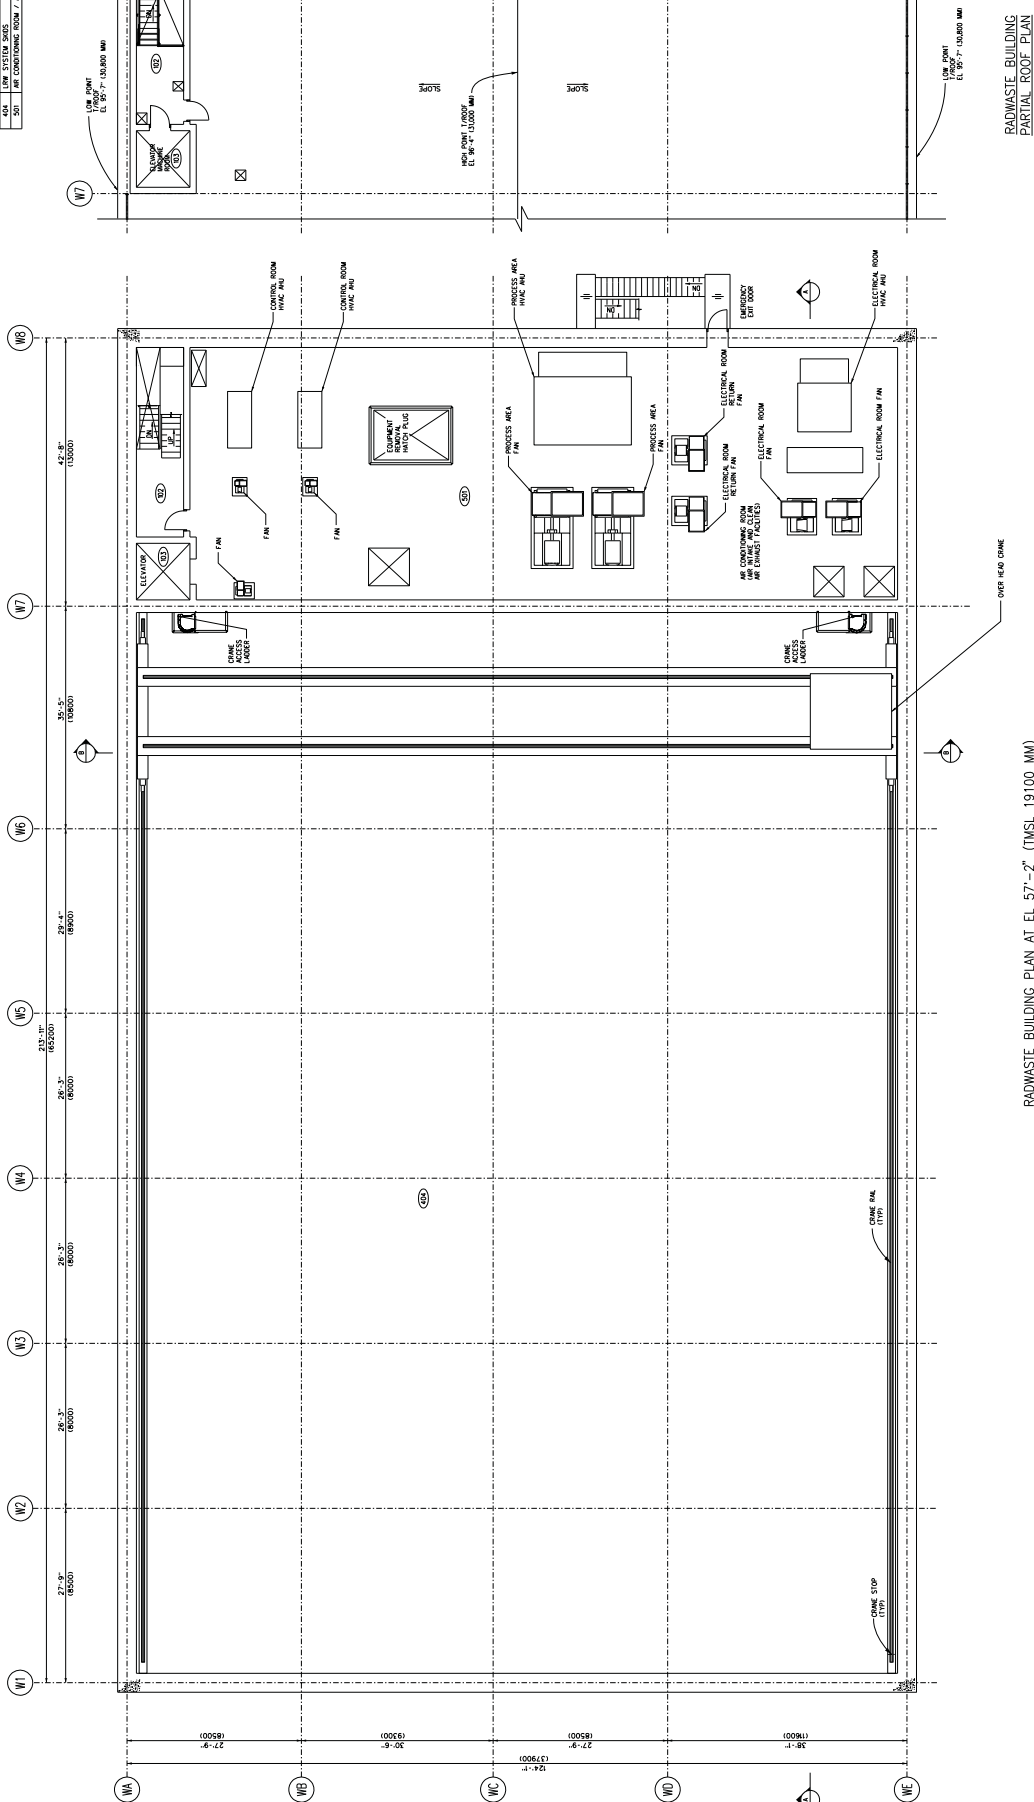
D RADWASTE BUILDING AT ELEVATION 19100 MM
